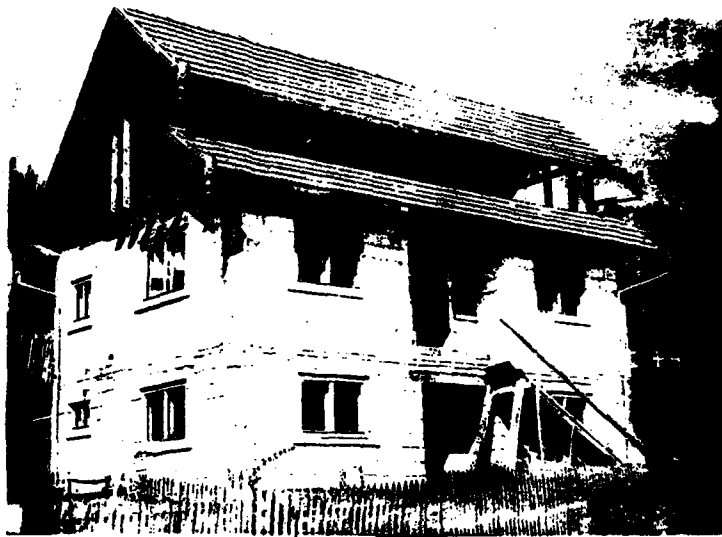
Contemporary rural building during construction works. Walls:ytong blocks framed by cast in place r.c. columns, collar beams, lintels. Stone foundation. Seismic zone:VIII degrees MSK. Upper story in timber. Materials and workmanship quality:very good.
